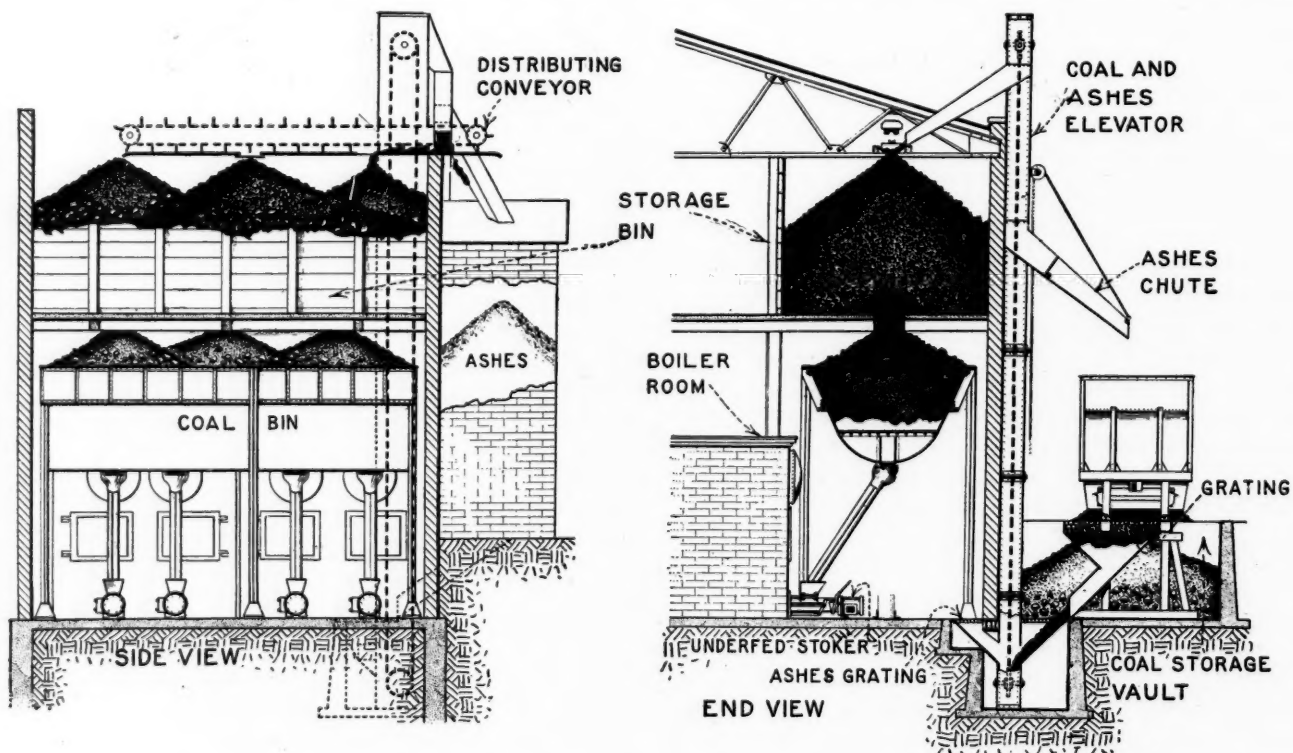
THE SAME ELEVATOR HANDLING COAL AND ASHES
